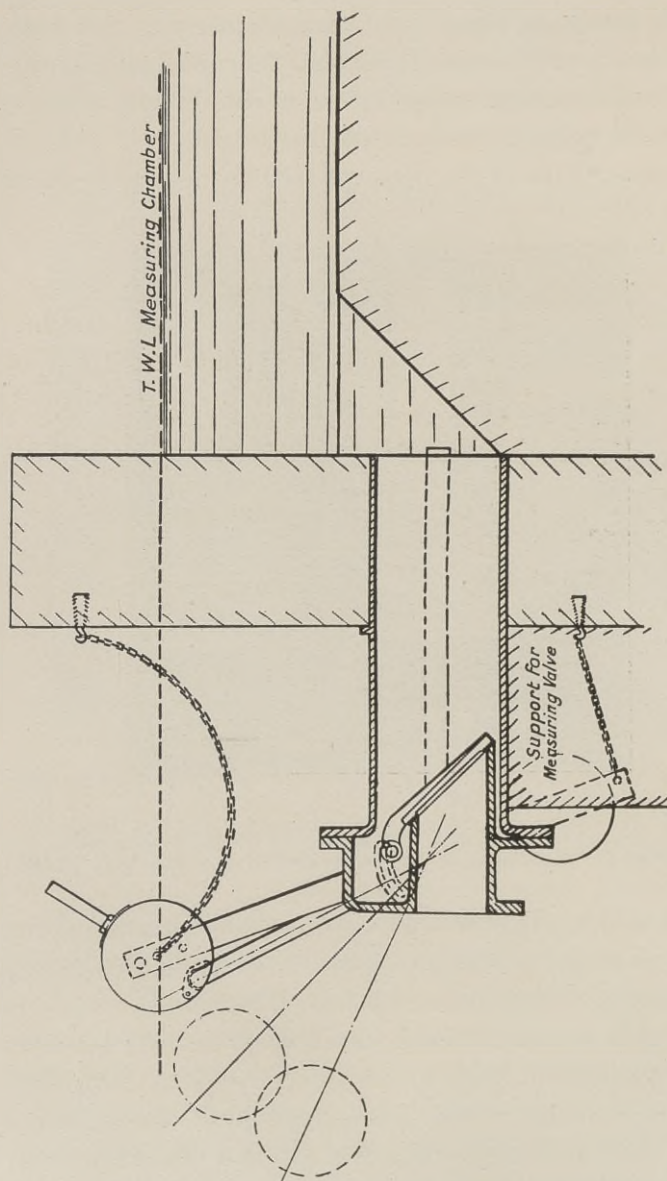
Section of Automatic Balanced Valve for Filling or Emptying Contact Beds.
